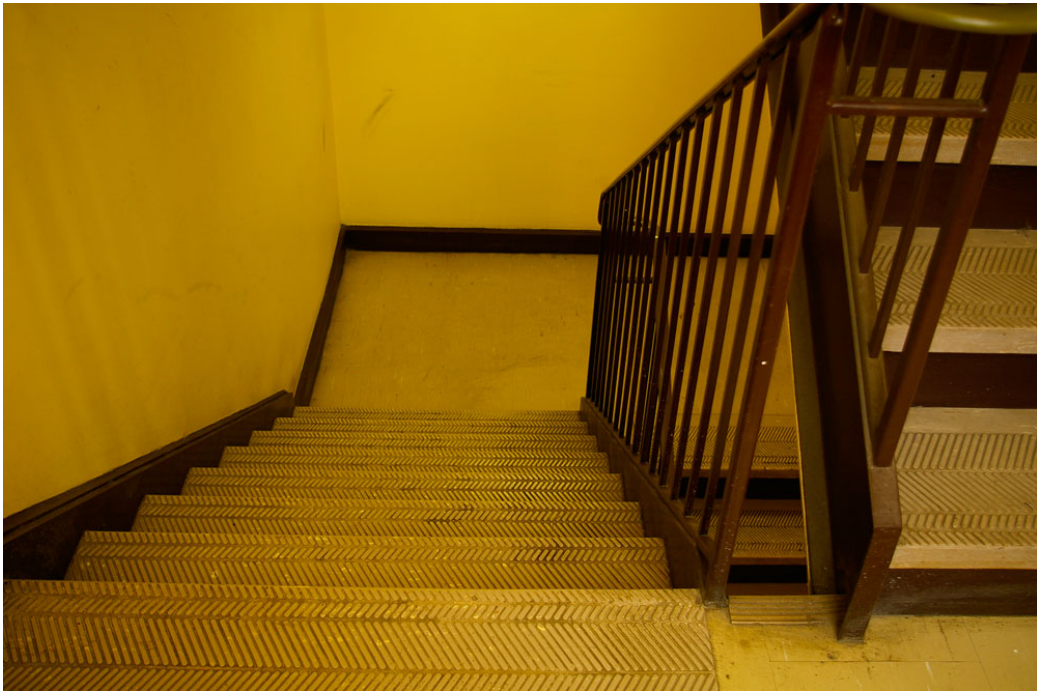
Inside the rear stairwell at the second floor level, looking down towards the landing and the west wall of the pre-1949 rear extension, directly above the new doorway. Shows the fireproof steel staircase (with rubber treads) and balustrade with the same linoleum tile flooring as on the first and second floors (but laid in a checkerboard pattern). Stair flight on the right leads up to the third floor.
